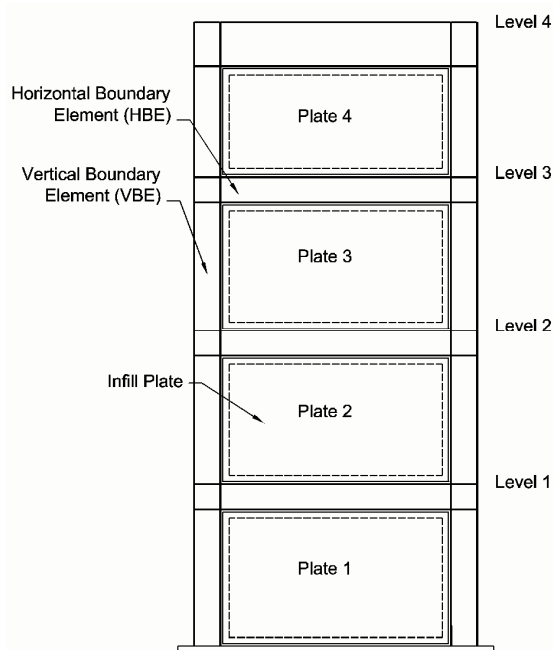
Typical steel plate shear wall (Bruneau et al., 2005).
